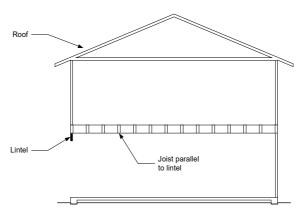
Lintels Supporting Roof and Wall (Refer Table 8.7)
